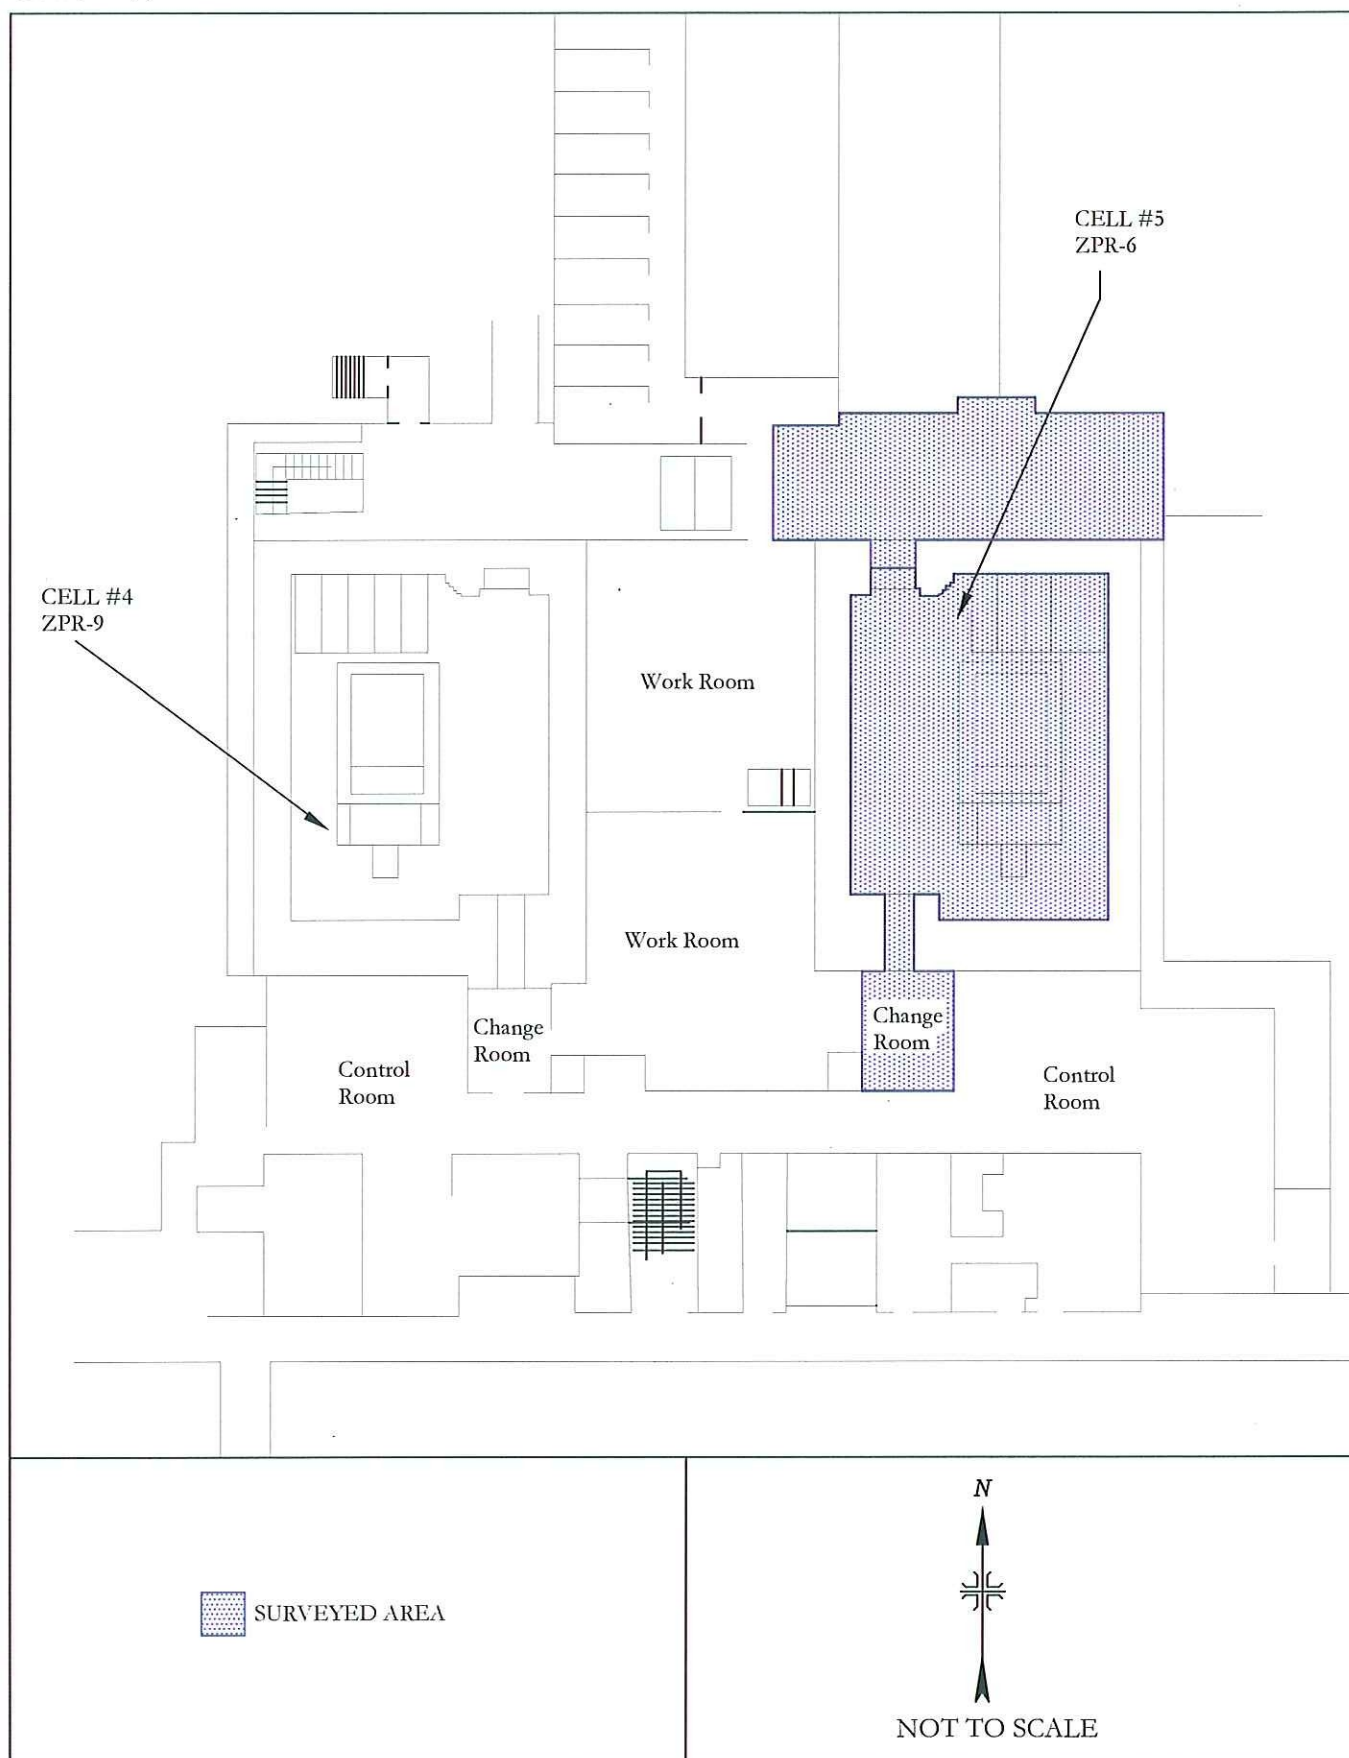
Plot Plan for Building 315 Main Floor, Indicating Location of Cell 5 (ZPR-6)
